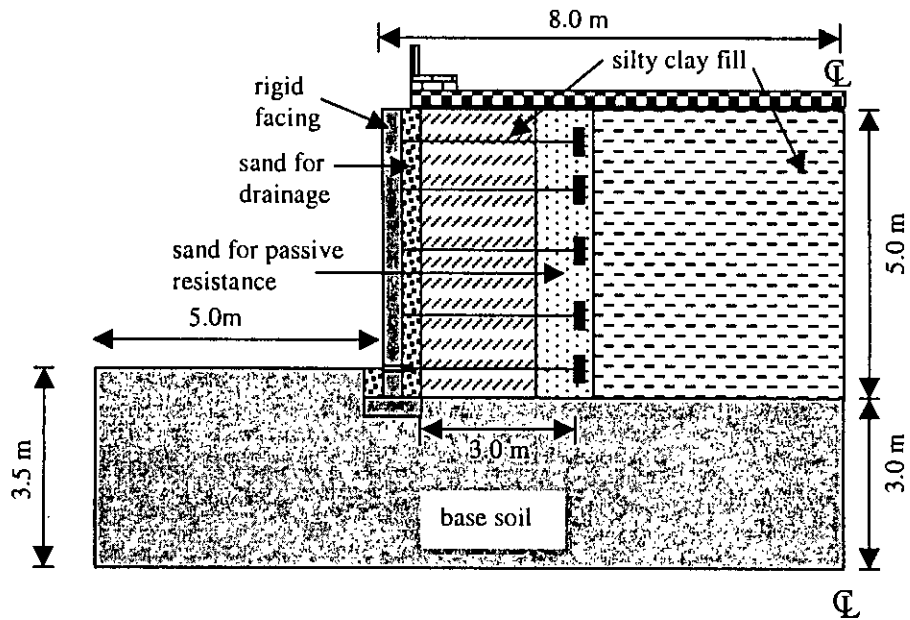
Geometry of anchored earth wall supporting a roadway.
